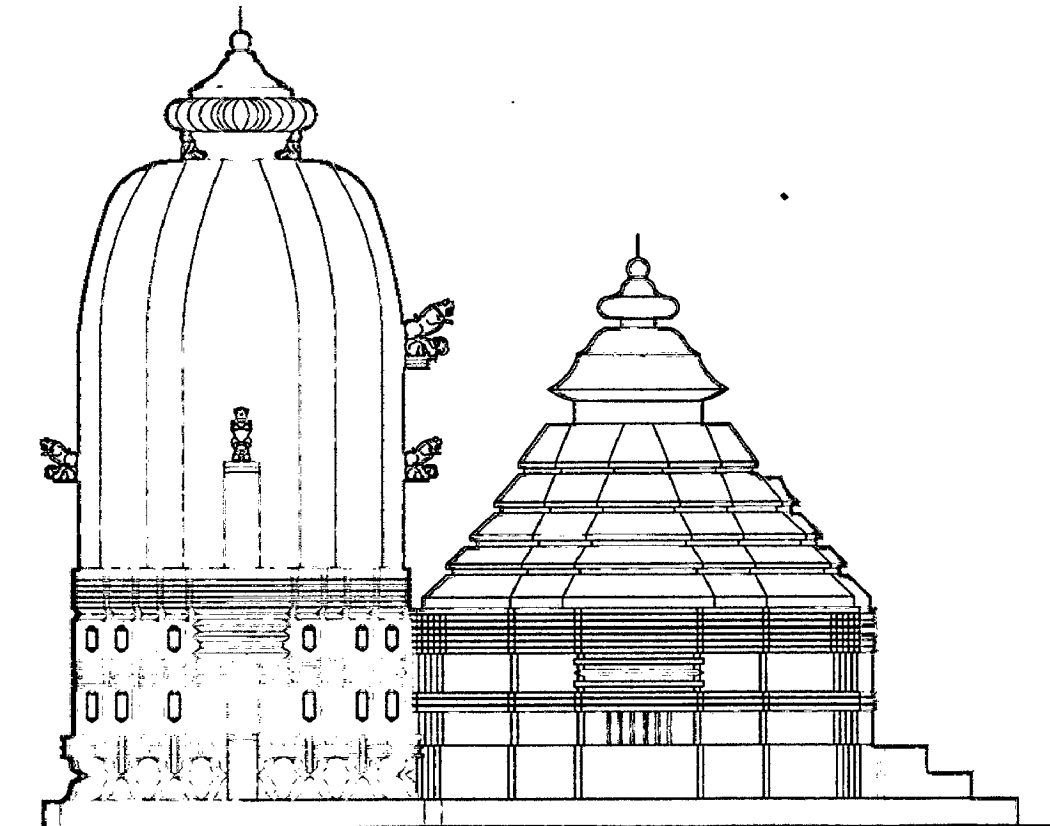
Right Side Elevation of Parasara Temple, Paradeep
